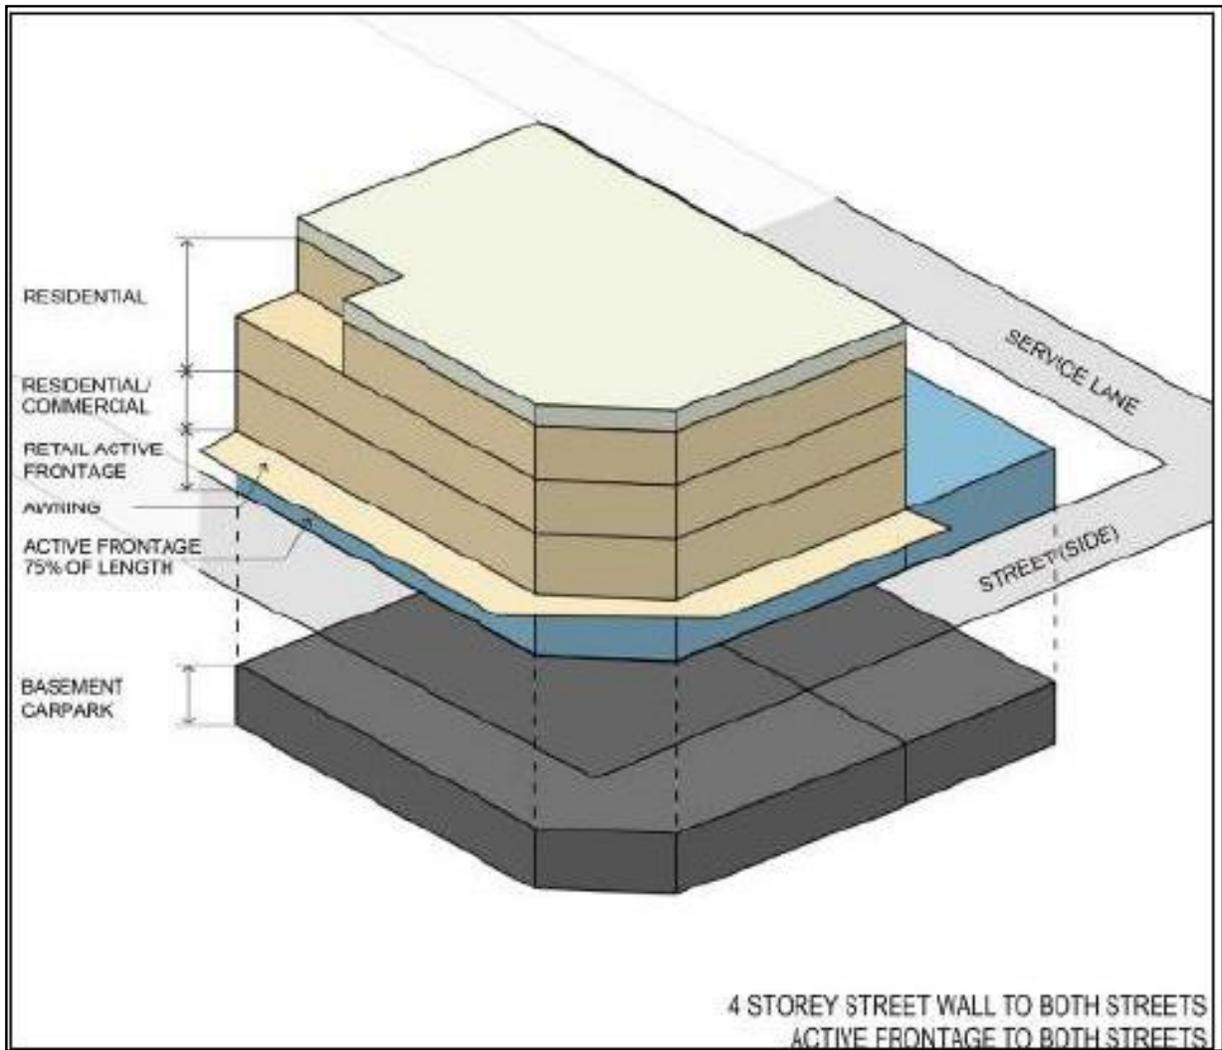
End block site design articulation (Fairfield Heights Town Centre Urban Design Study, 2018)
